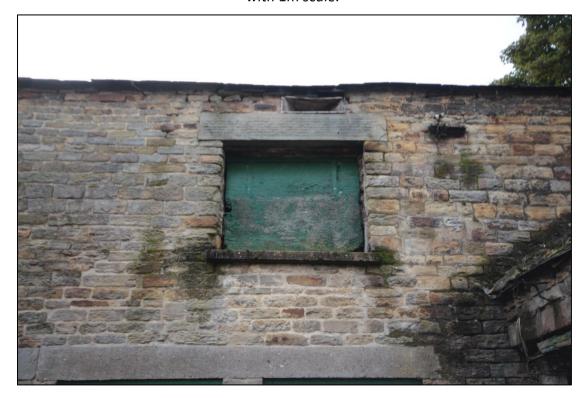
Pitching hole with lintel and sill on the internal eastern elevation.
